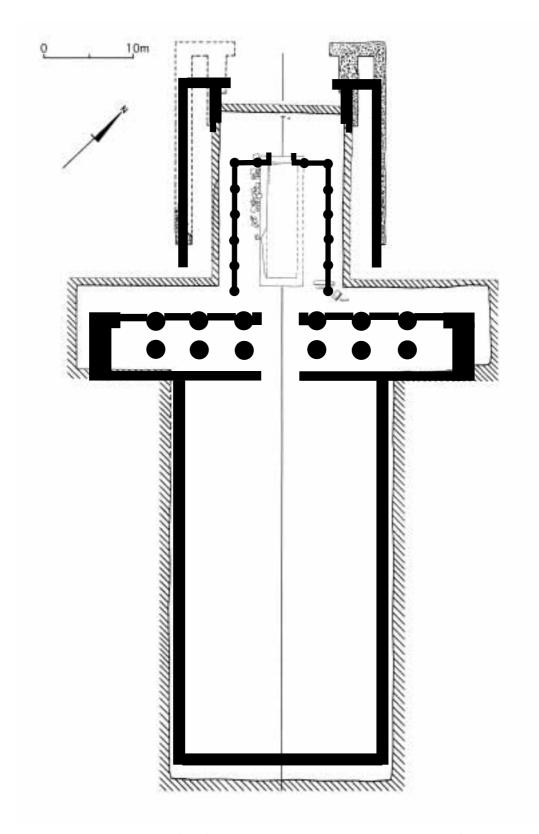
Plan showing the outline of the foundation superimposed with a reconstruction of the temple.
